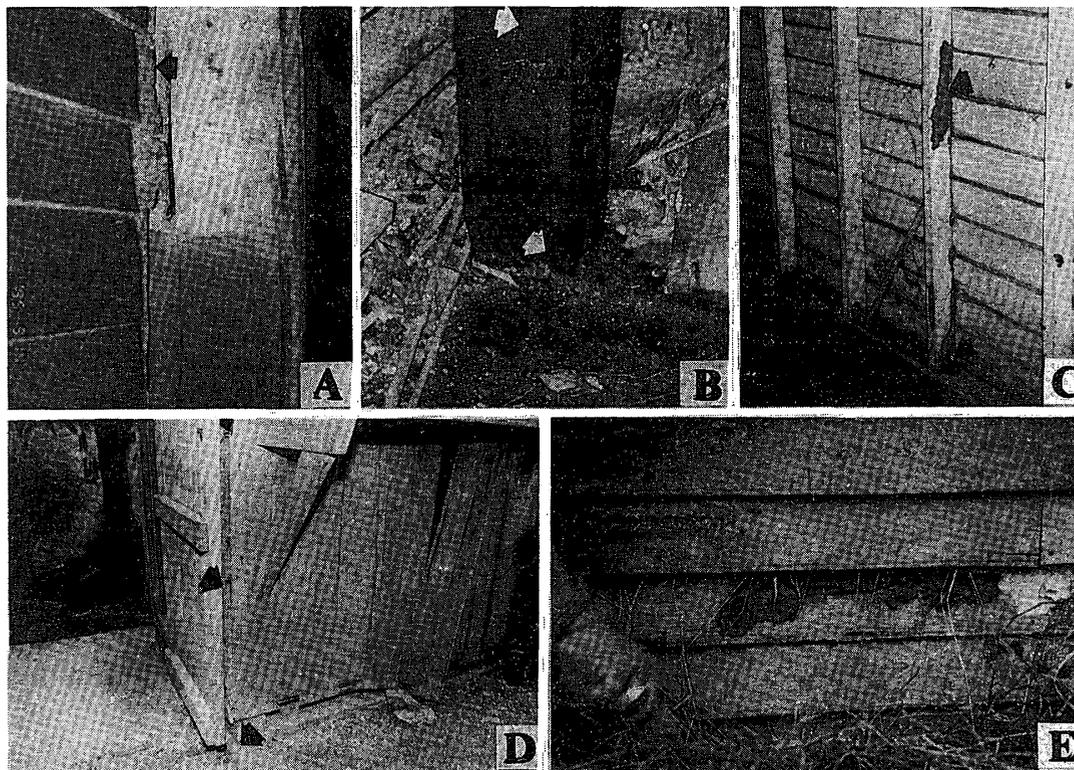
Woodworks direct to ground contact inviting termite into building. A-B: Termite damage on wood sidings (A) and pole (B), from shelter tube through cracks in wooden pole in high pole house, Nakhon Sawan Province, C-E: Wood sidings, stud or interior column infested by subterranean termite, in slab on ground house, Nonthaburi (C, D) and Nakhon ratchasima Province (E).
